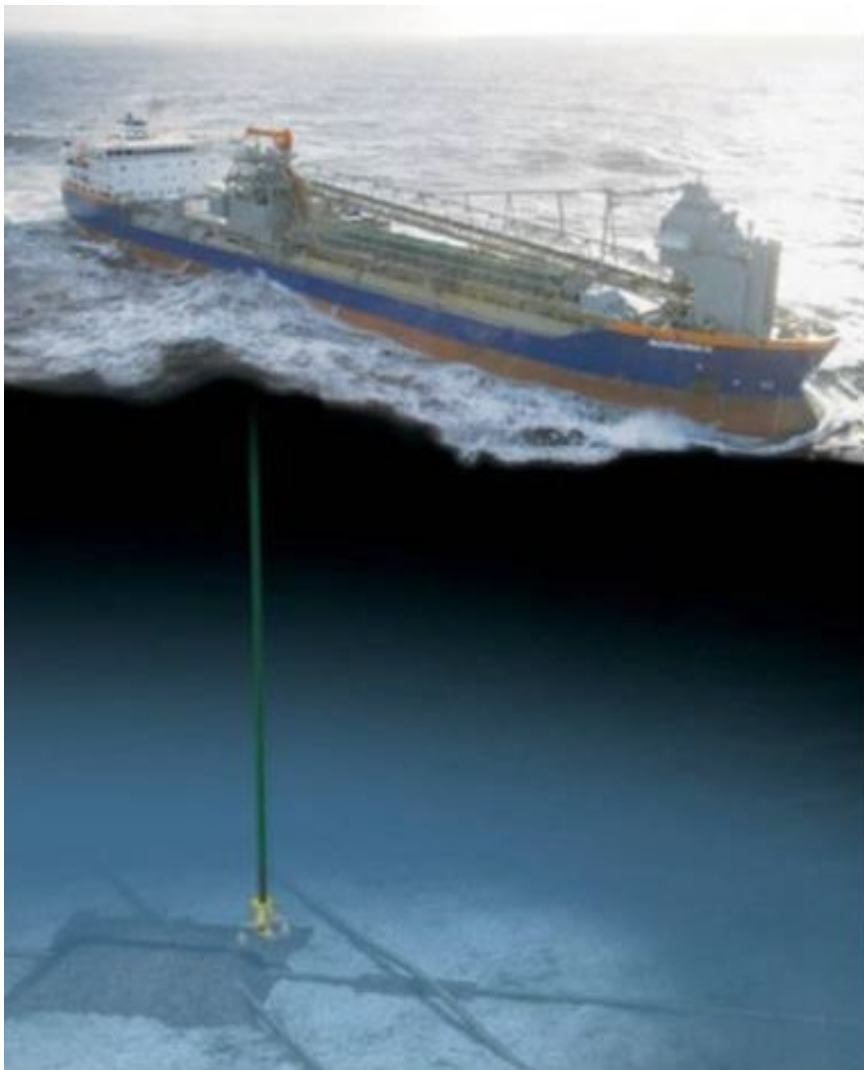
Fall pipe vessel for rock installation (Beemsterboer, 2013).
